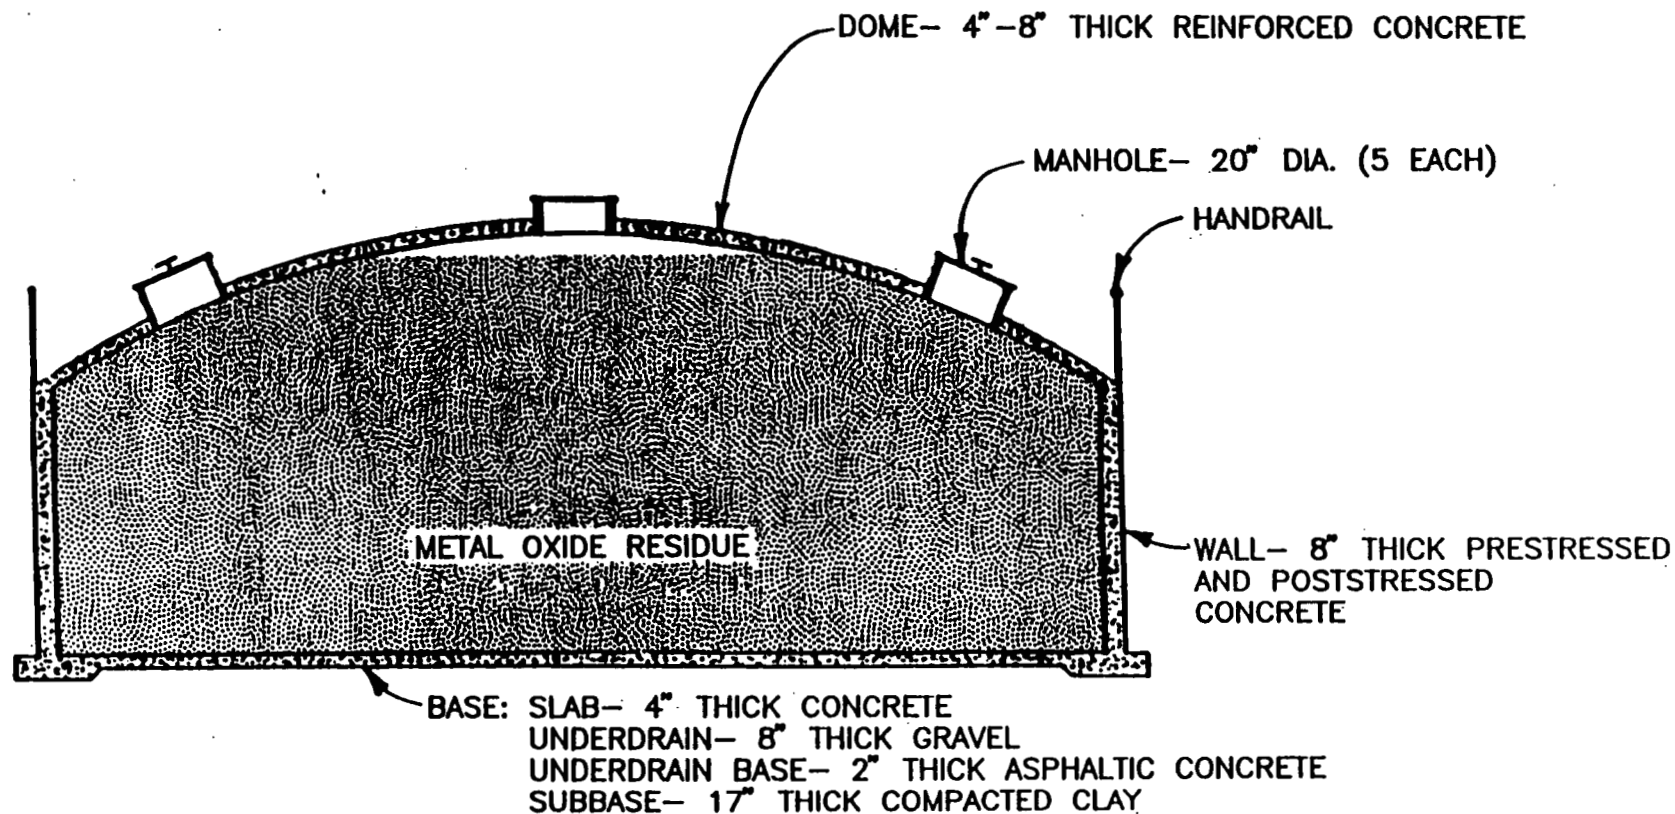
CROSS-SECTION THROUGH SILO 3
